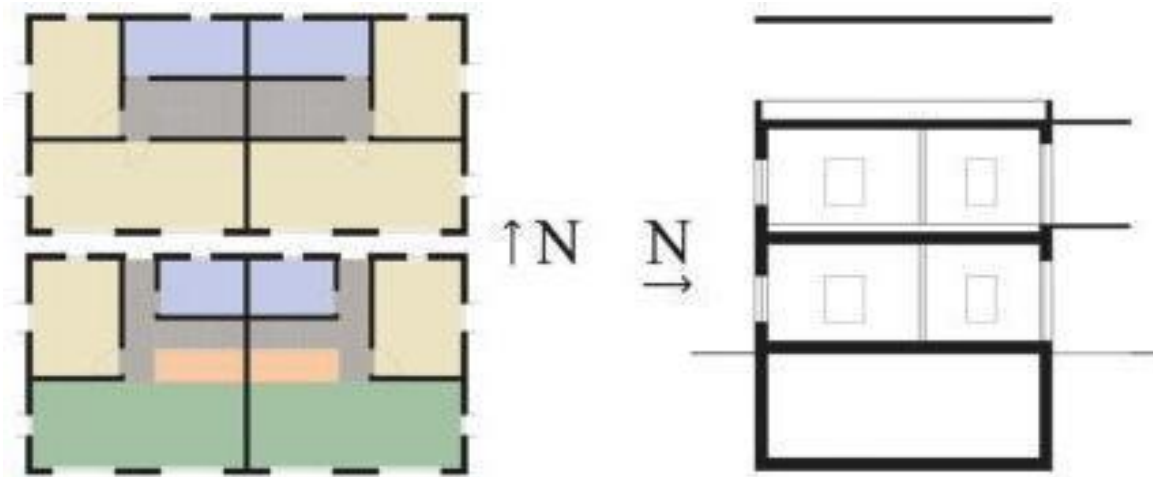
Plan and Section of the BBH; yellow: bedroom, blue: bathroom, grey: circulation, orange: kitchen, green: lounge
